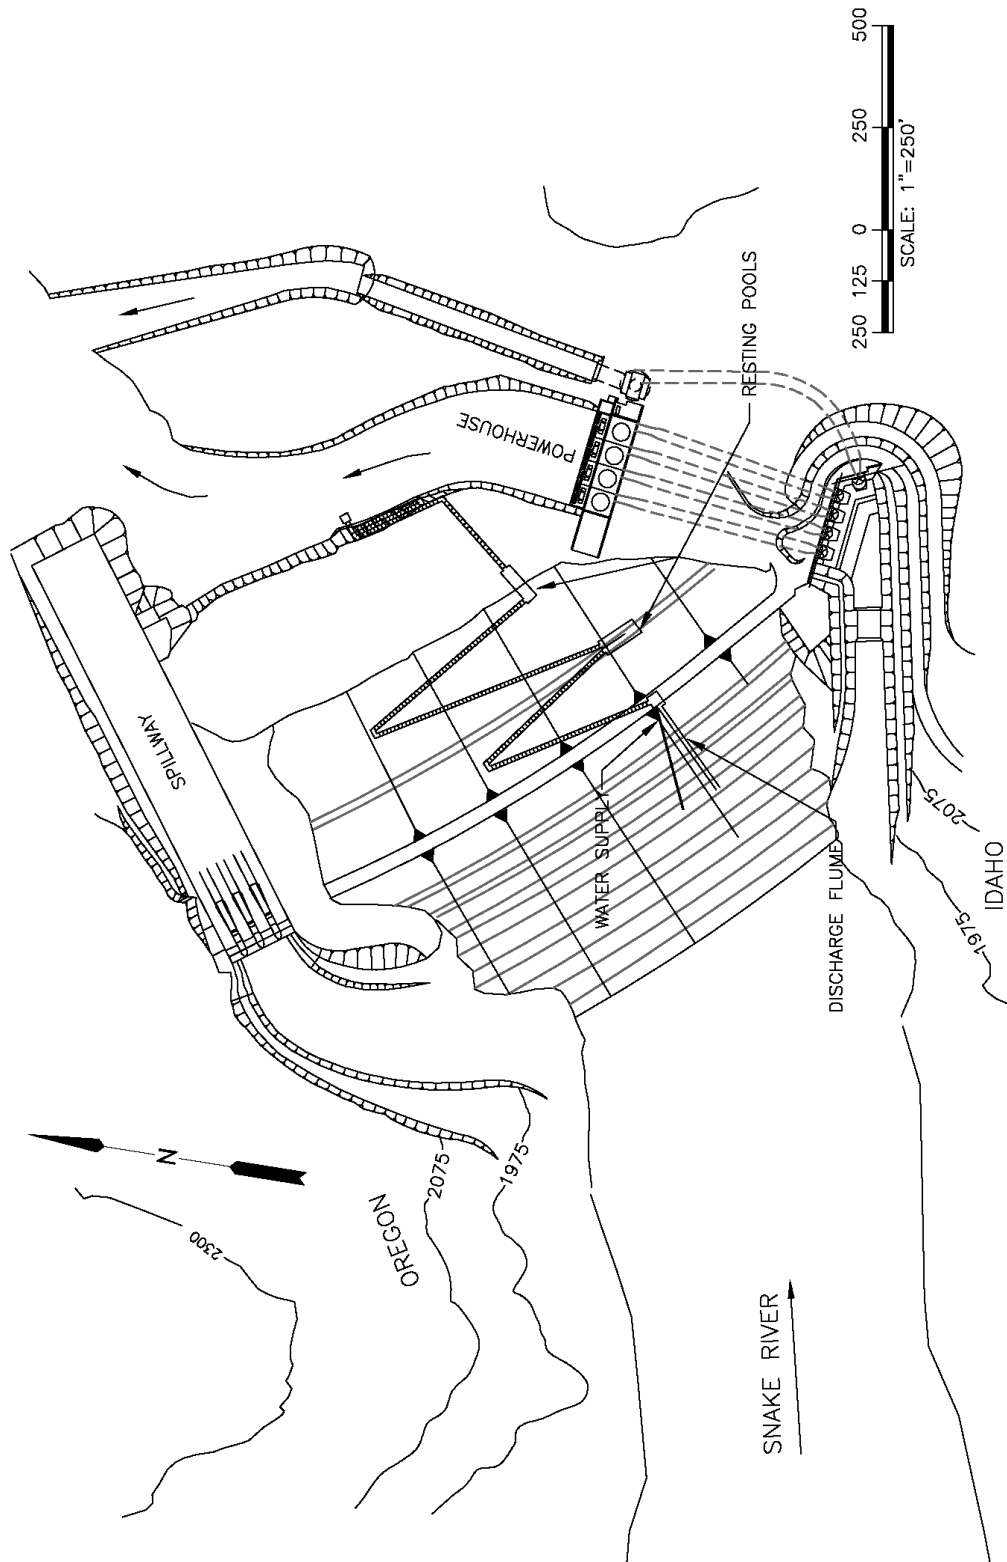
Proposed location of fish ladder at Brownlee Dam.
